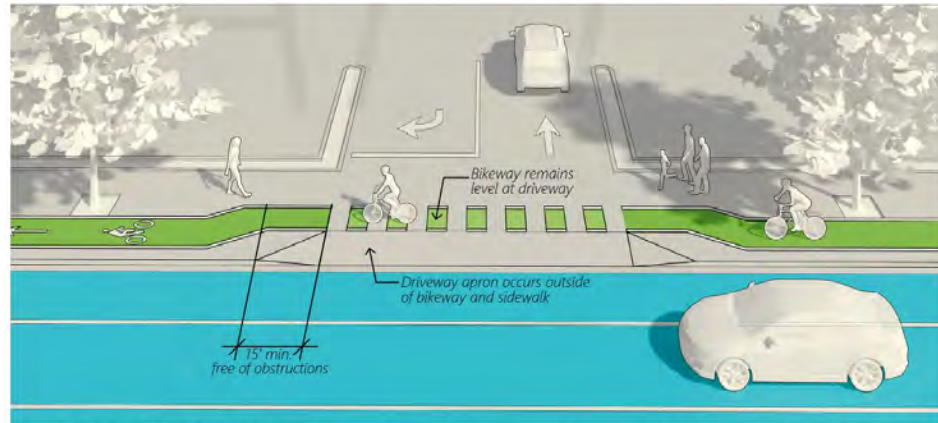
Sidewalk-level class IV bikeway at a driveway, where the driveway apron slopes outside of the bikeway and sidewalk.
